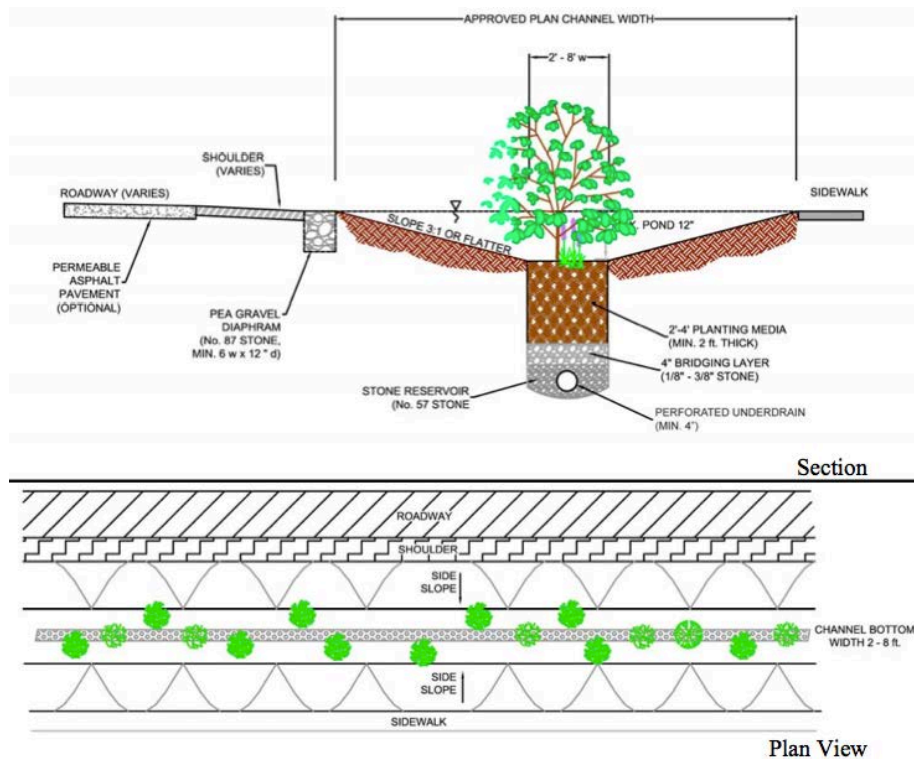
Bio-swale Plan and Section View (MDE, 2009)
